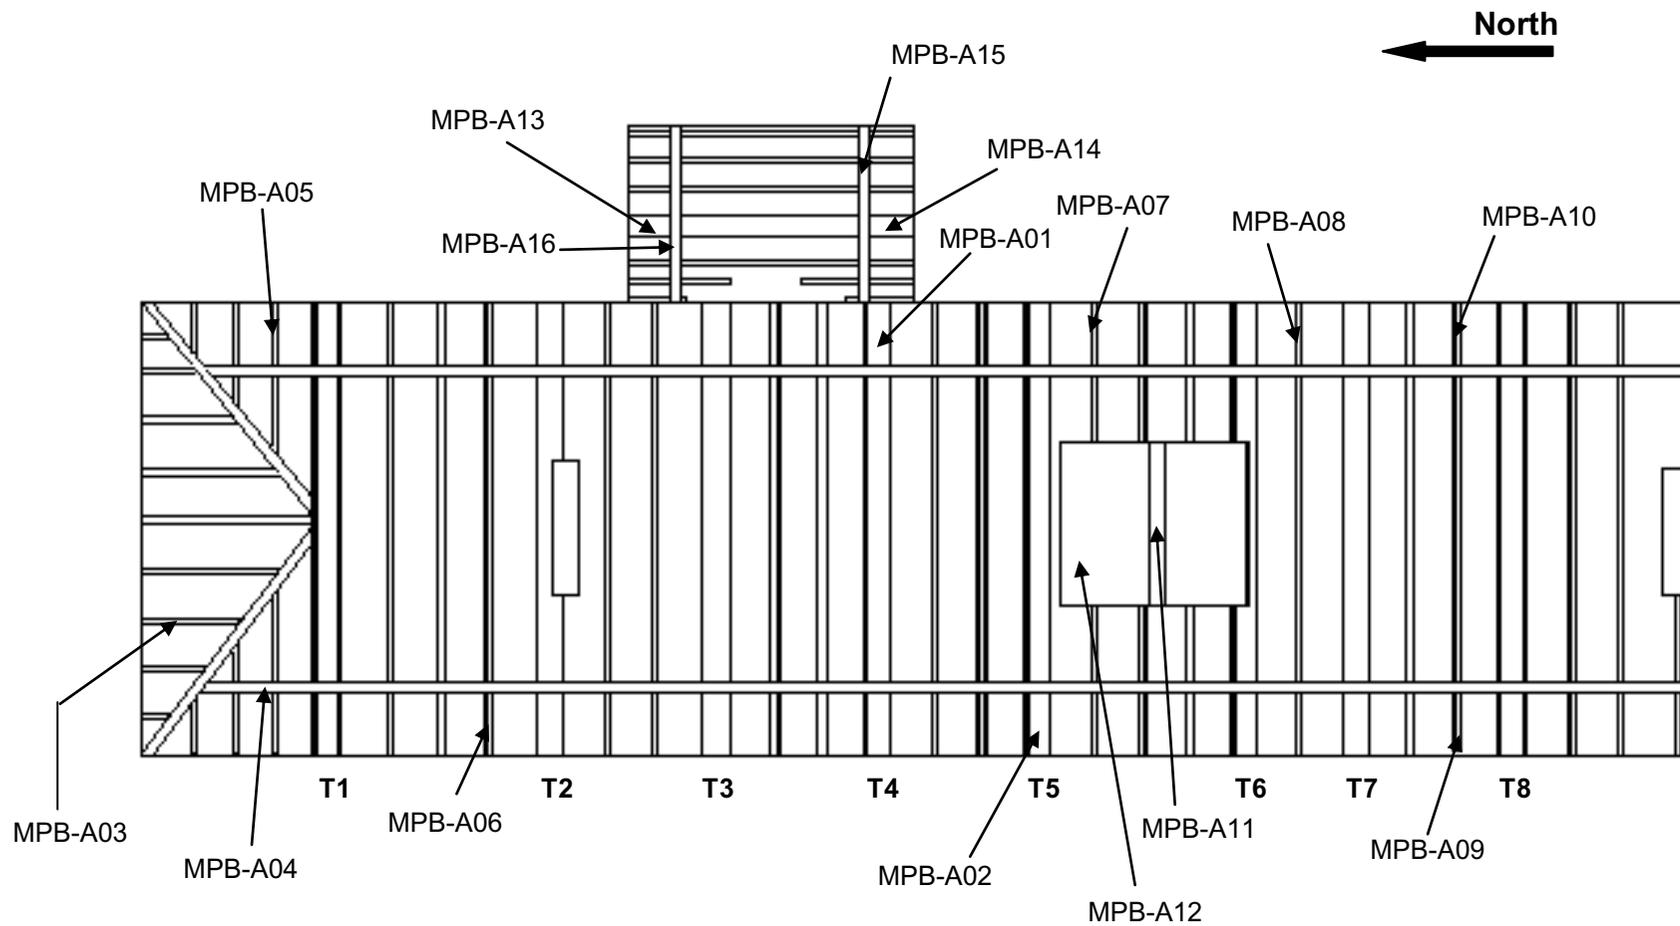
Sketch plan of the roof, showing the location of samples MPB-A01-16
